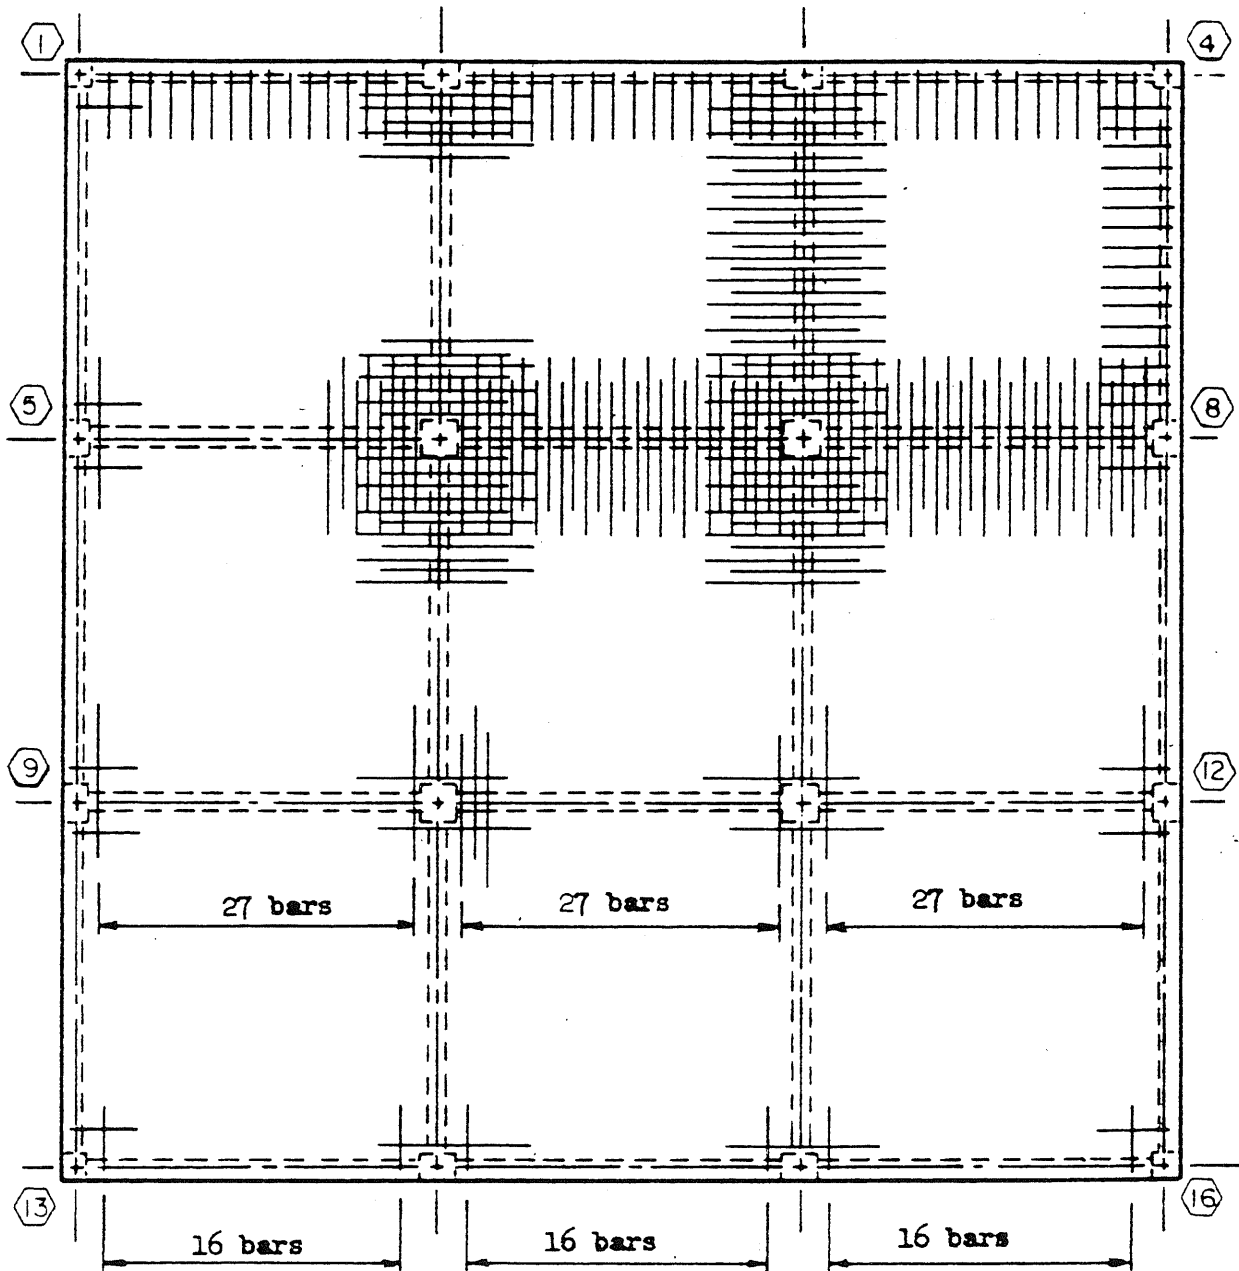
ARRANGEMENT OF BOTTOM REINFORCEMENT IN TYPICAL TWO-WAY SLAB (T1)
